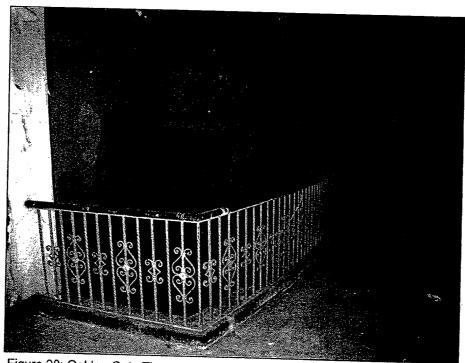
Golden Gate Theater, interior, view southwest from balcony looking toward stair from lobby (Chattel Architecture 2009)
